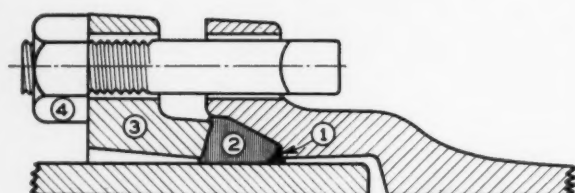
A typical mechanical joint for cast iron pipe. 1—Lead ring. 2—Endless ring gasket. 3—Cast iron gland. 4—High strength cast iron bolts.
